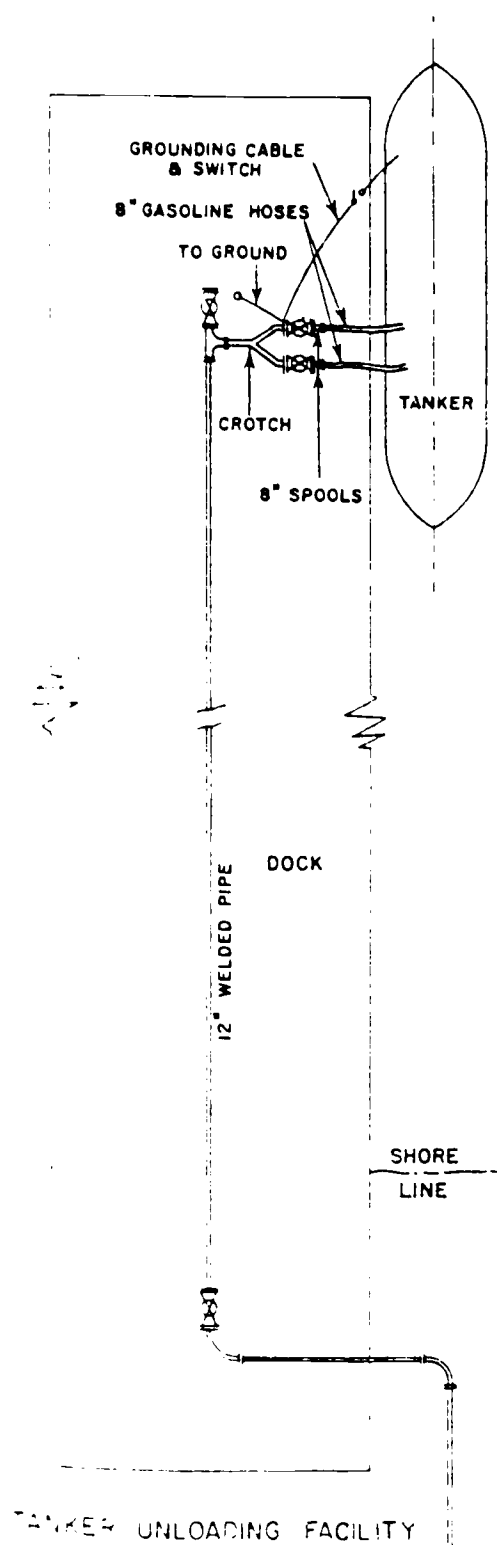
Layout of marine dock facilities for tanker unloading.
